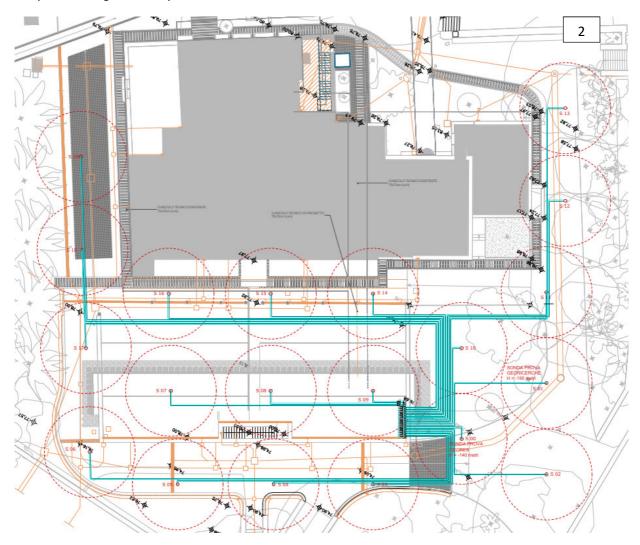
Embassy construction plan with the originally planned 20 geothermal probes Source: M.R. Progetto Impianti Rom
